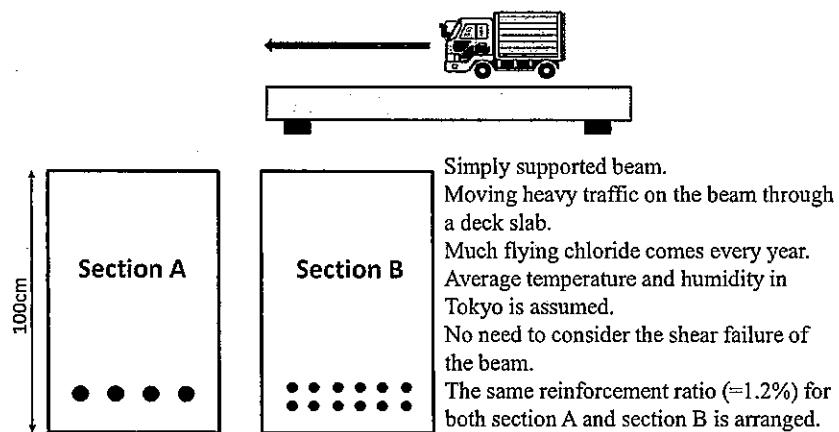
Reinforced concrete beam subjected to moving traffic loads
